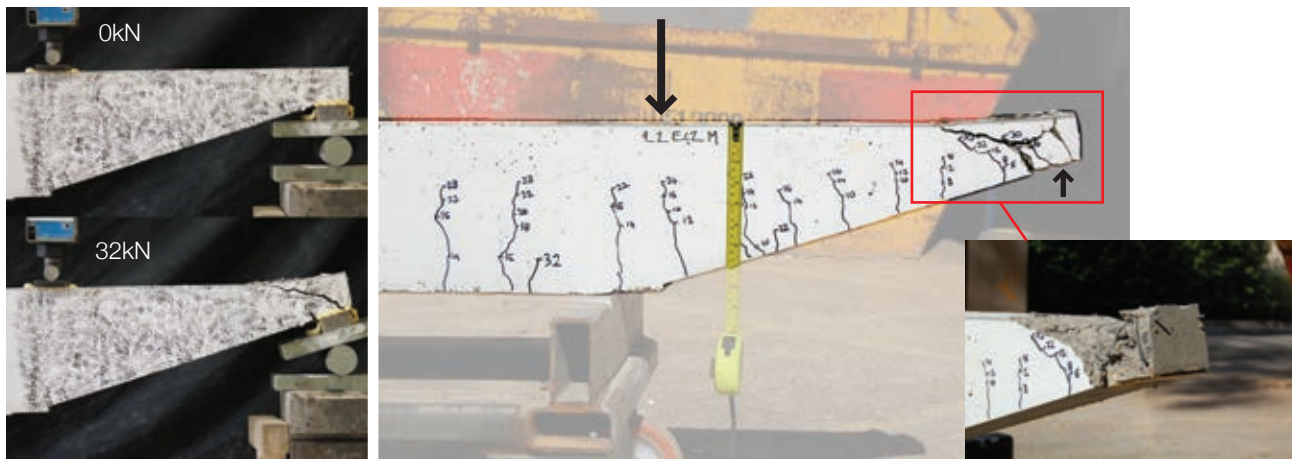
Cracking and failure in Beam 9\_2\_EC2\_M(ii).
